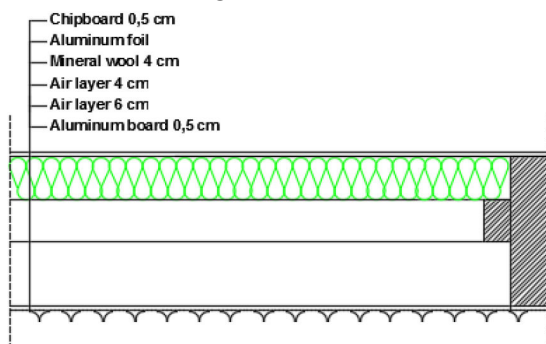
non-load bearing exterior wall of the JU-61 building type.
